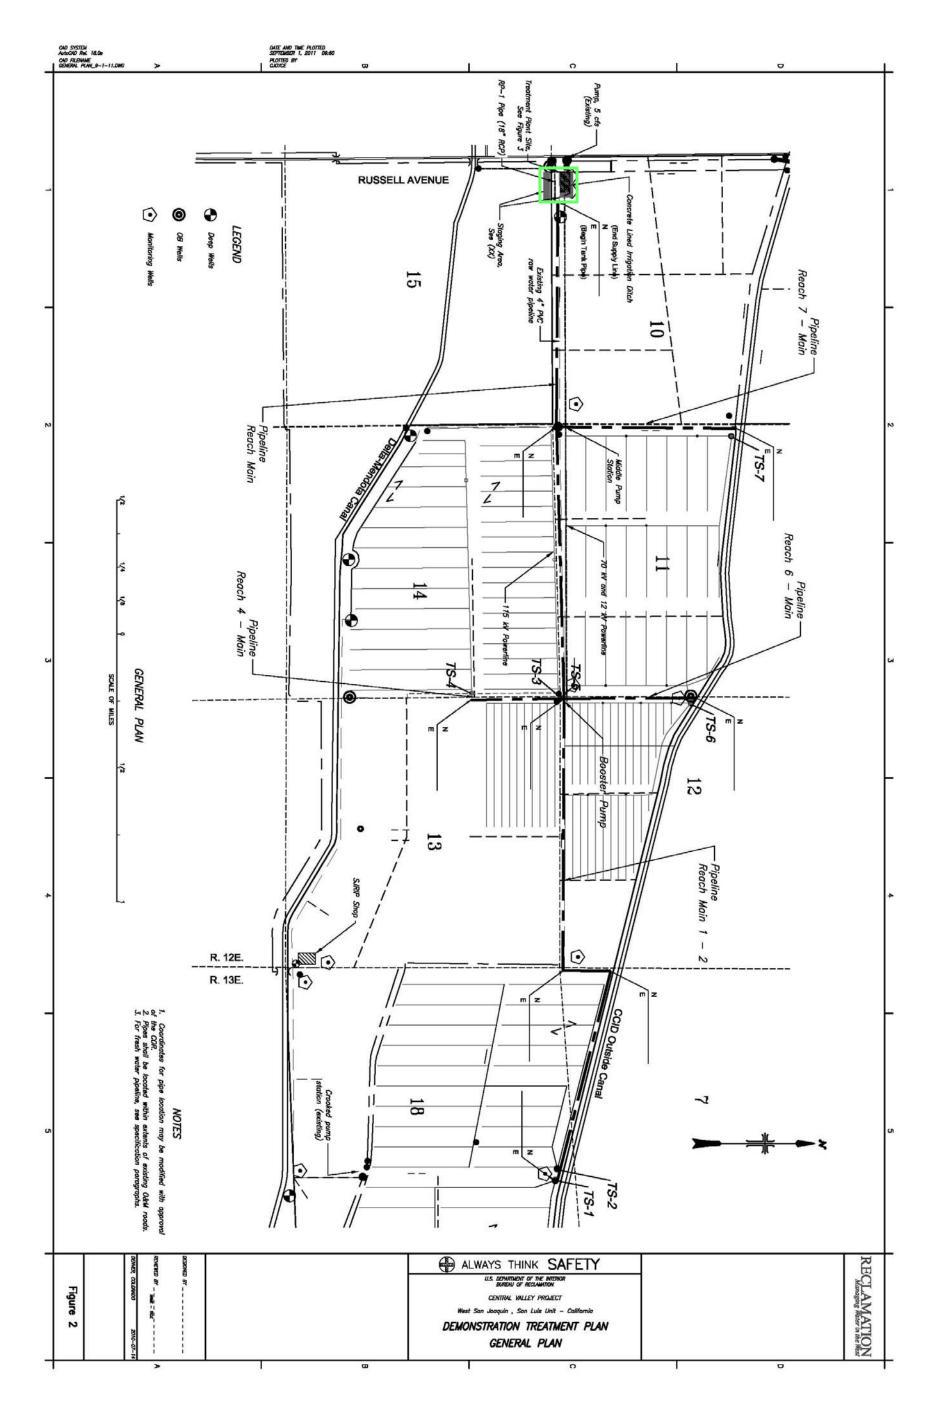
Proposed Action area (approximate 4-acre Facility footprint and 8-acre temporary staging area outlined in green)
